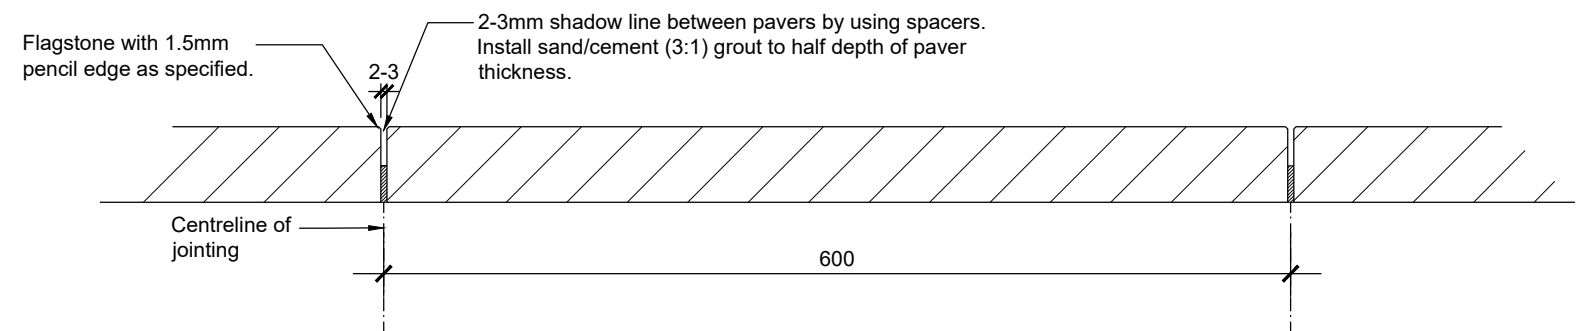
Typical Concrete Joint Layout on Footpath – Full Granite Treatment
